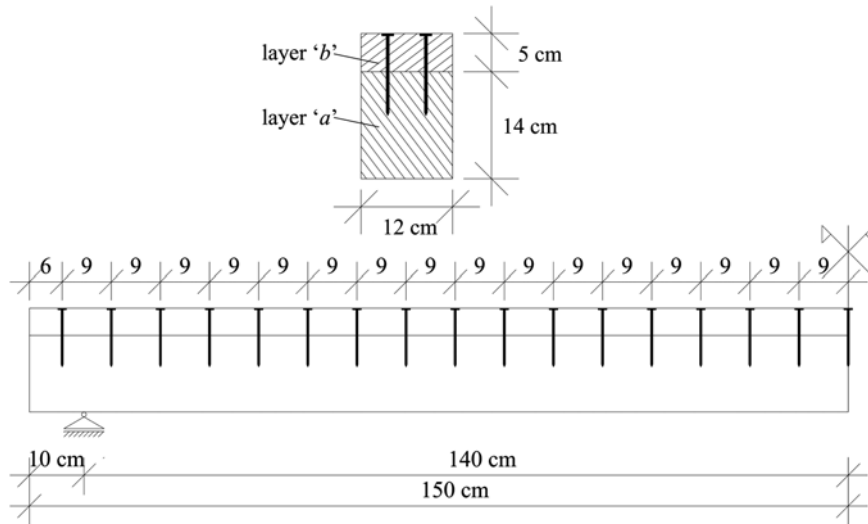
Cross-section of composite timber beam and the arrangement of connectors
